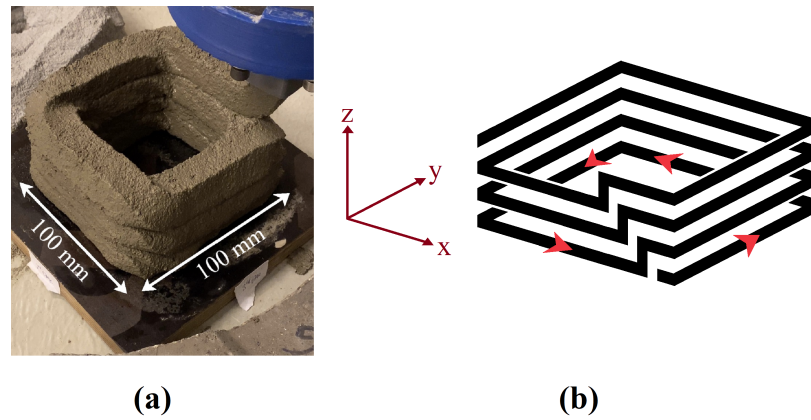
Buildability test setup, (a) geometry and dimension of the printed hollow cube for buildability test, (b) printing path.
